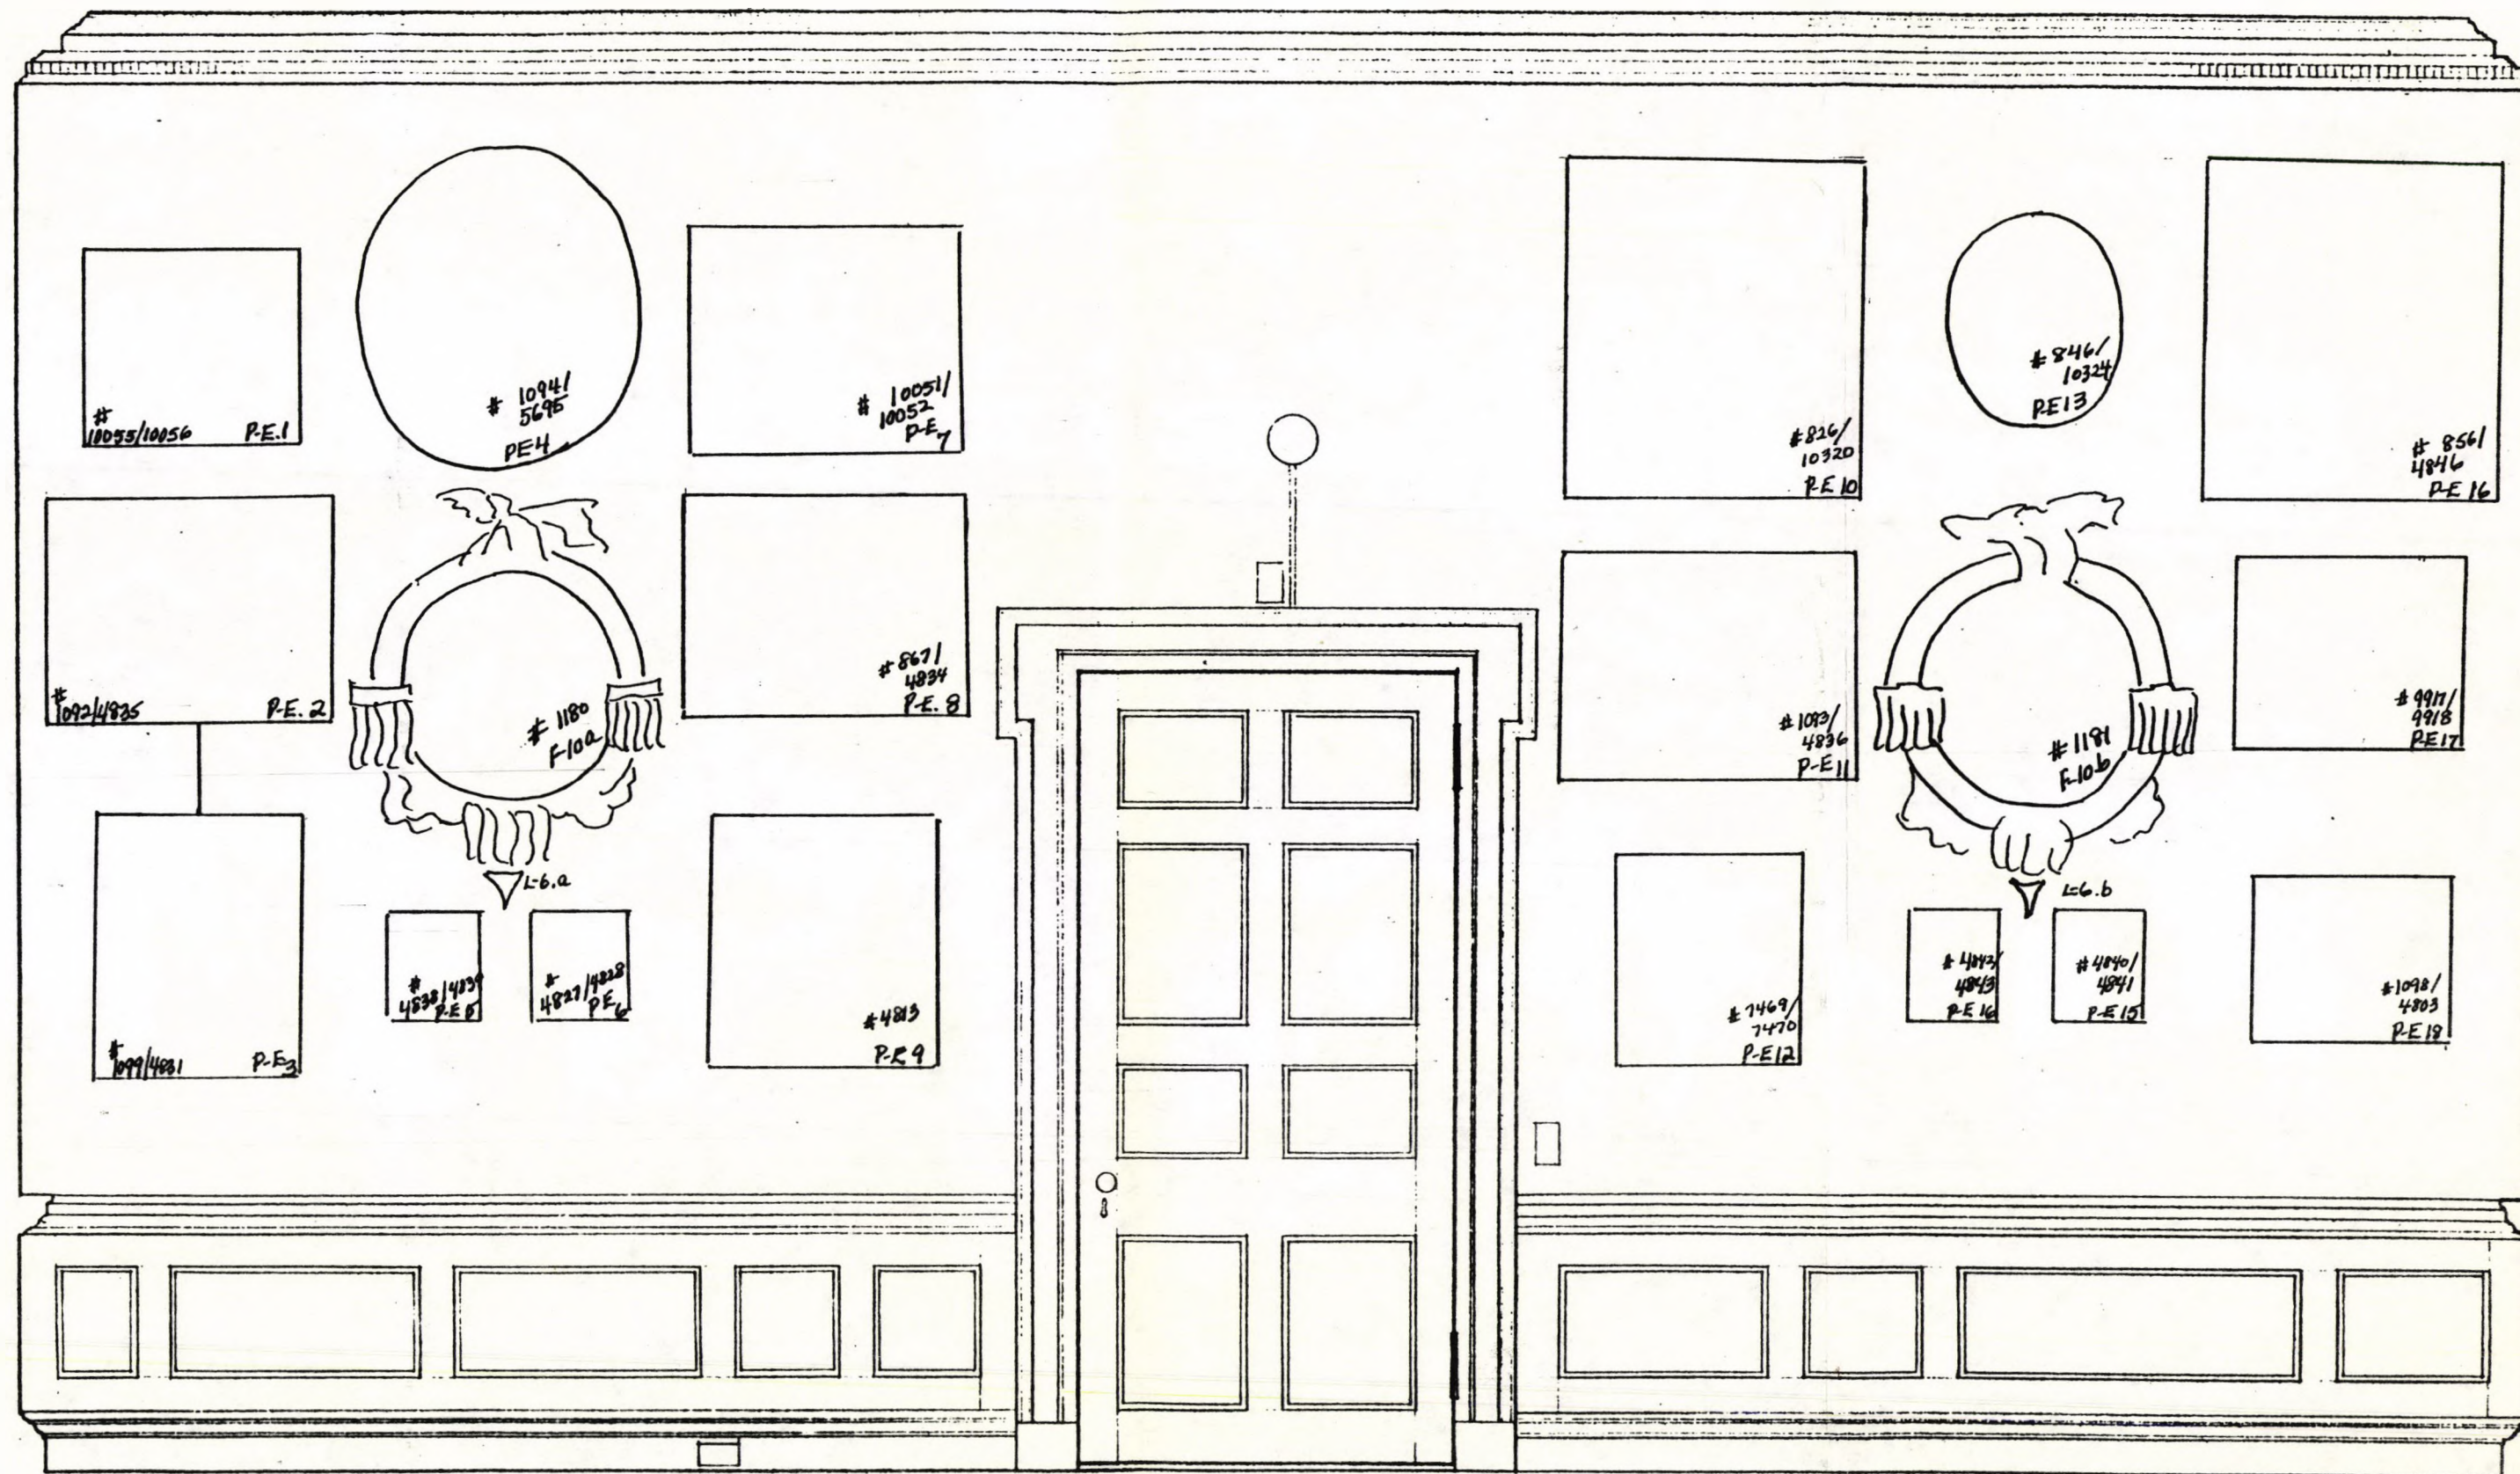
Sample furnishing plan, Music Room, East elevation.
